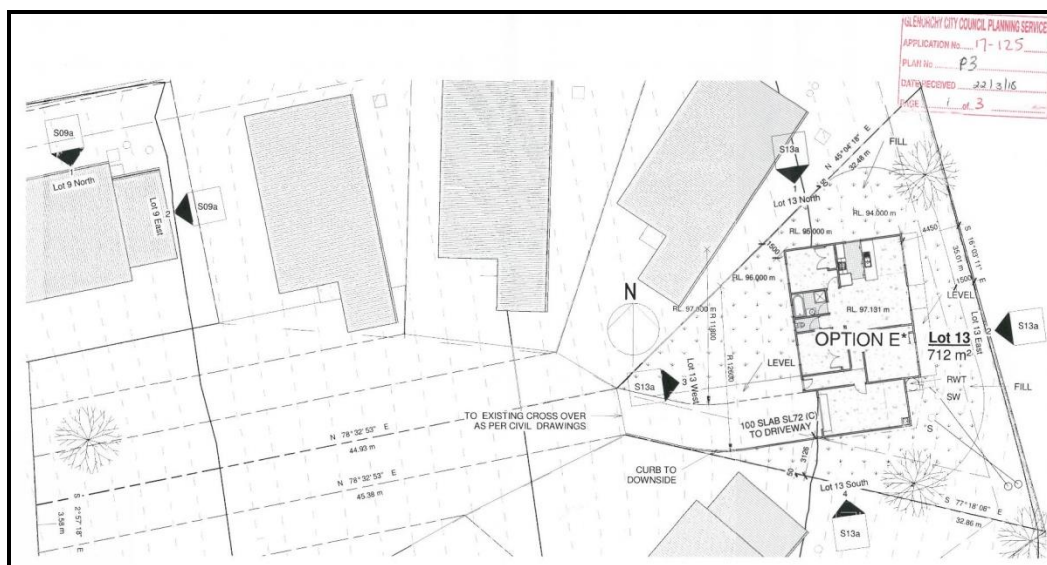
Site Plan for 44 McGill Rise, Claremont.
